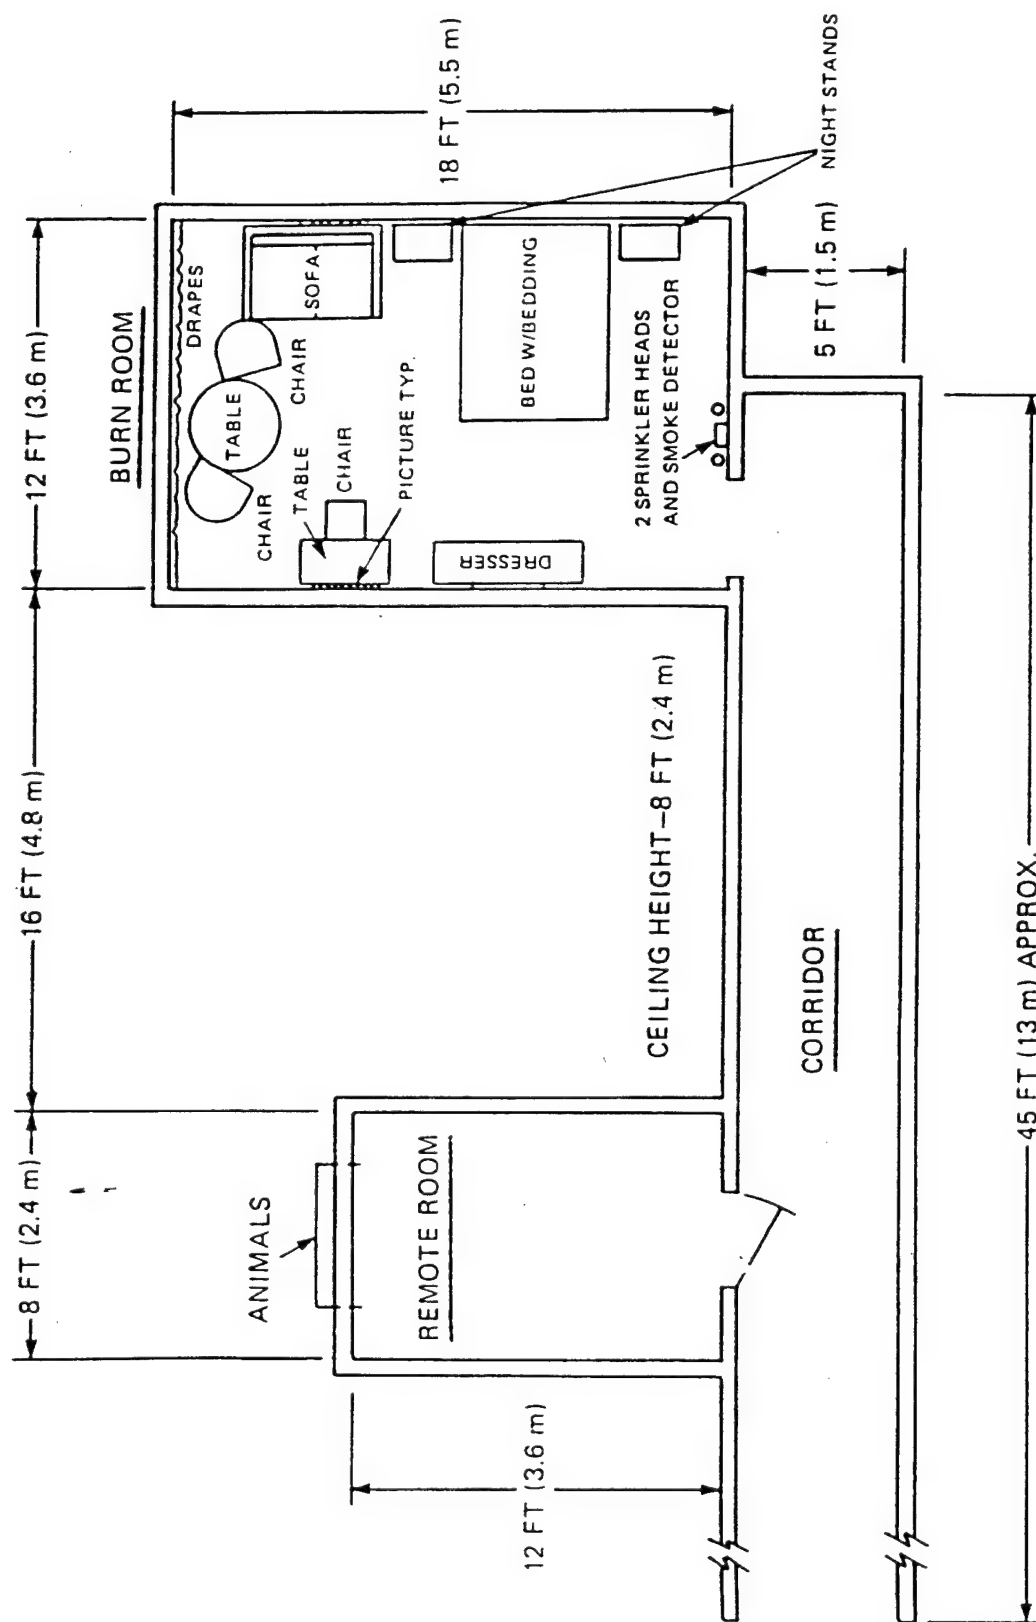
Burn room, corridor, and remote room full-scale test facility at Southwest Research Institute
